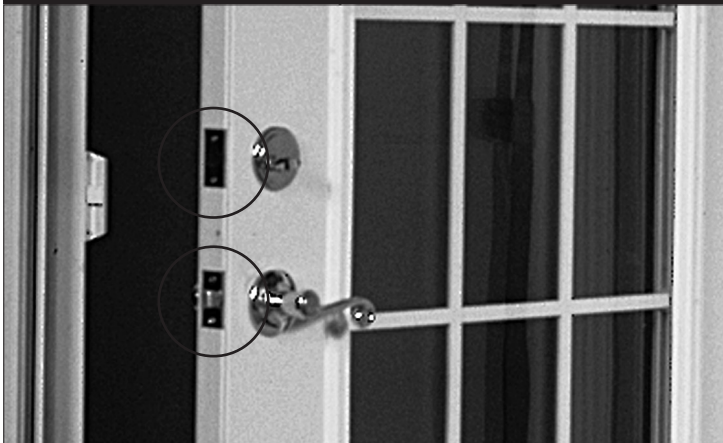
The latch and dead bolt are installed per the hardware manufacturer installation detail.
